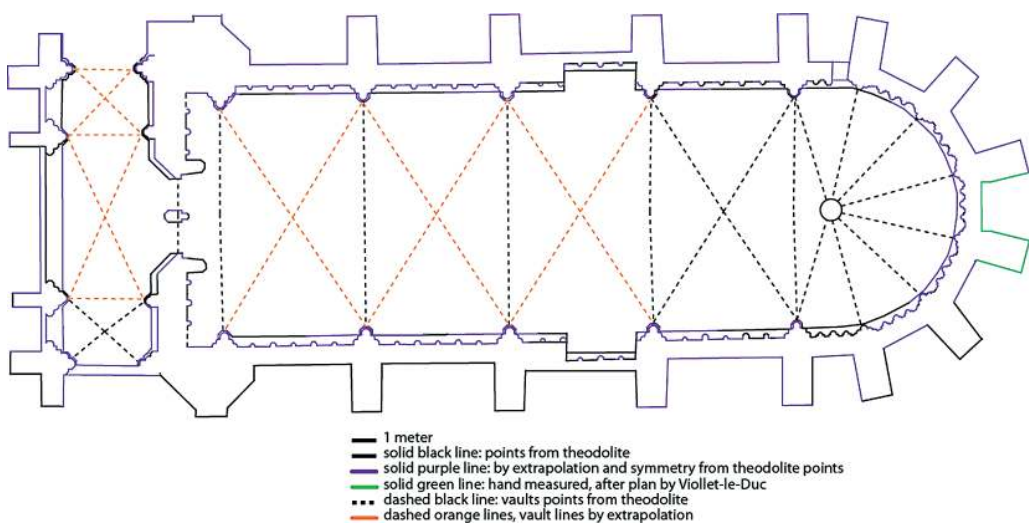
Plate VII. Paris, Sainte-Chapelle, upper chapel, plan by author.
